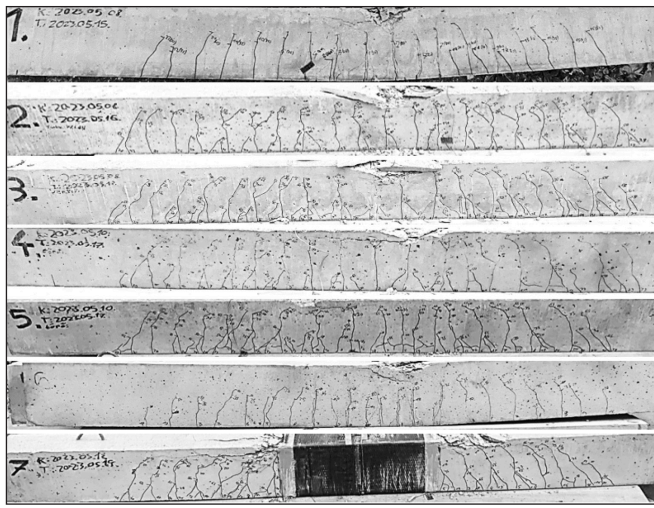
The beams laid out after testing, their crack patterns and failure zones visible
